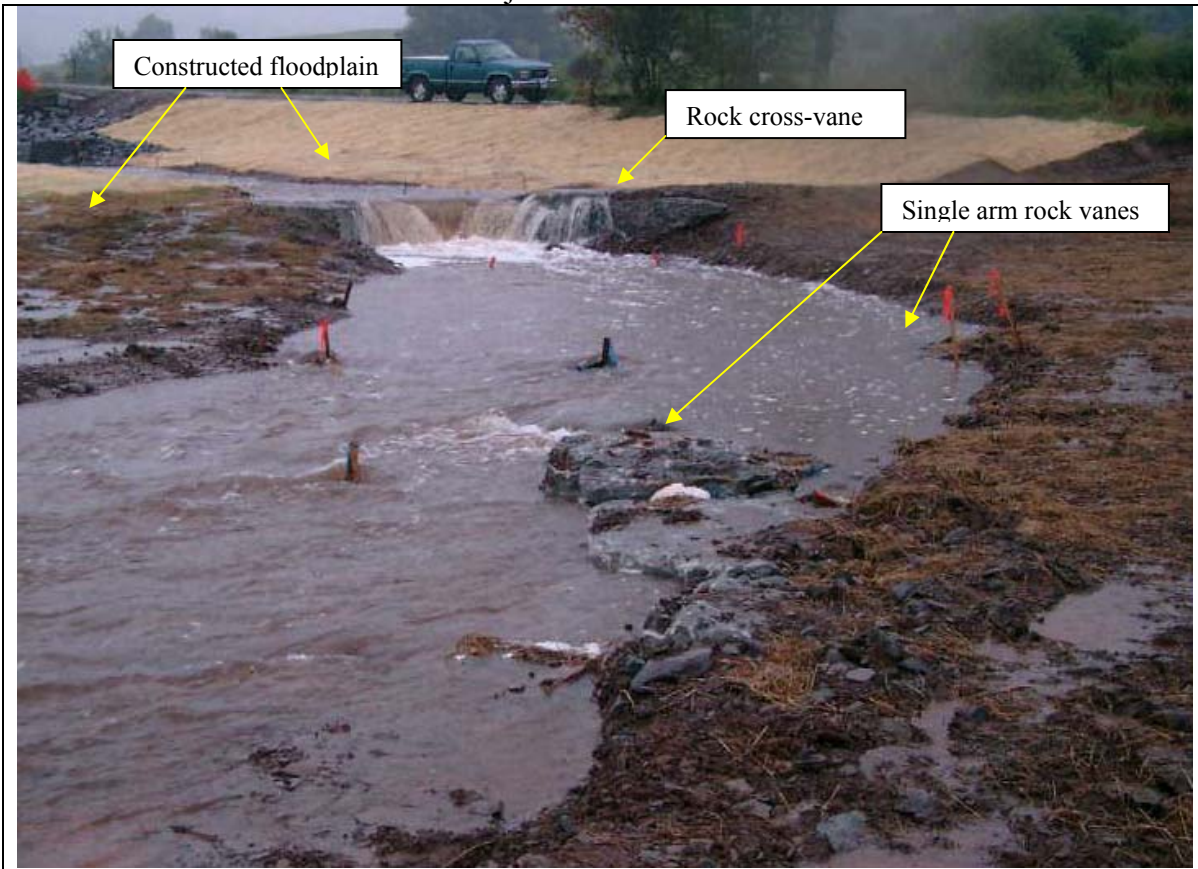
Looking U.S. at near bankfull flow across three structures, 8-13-04.
